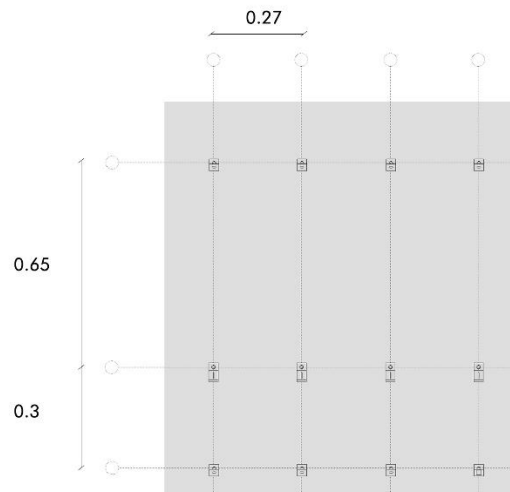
Supporting structural grid for the facade panels on a loadbearing wall
